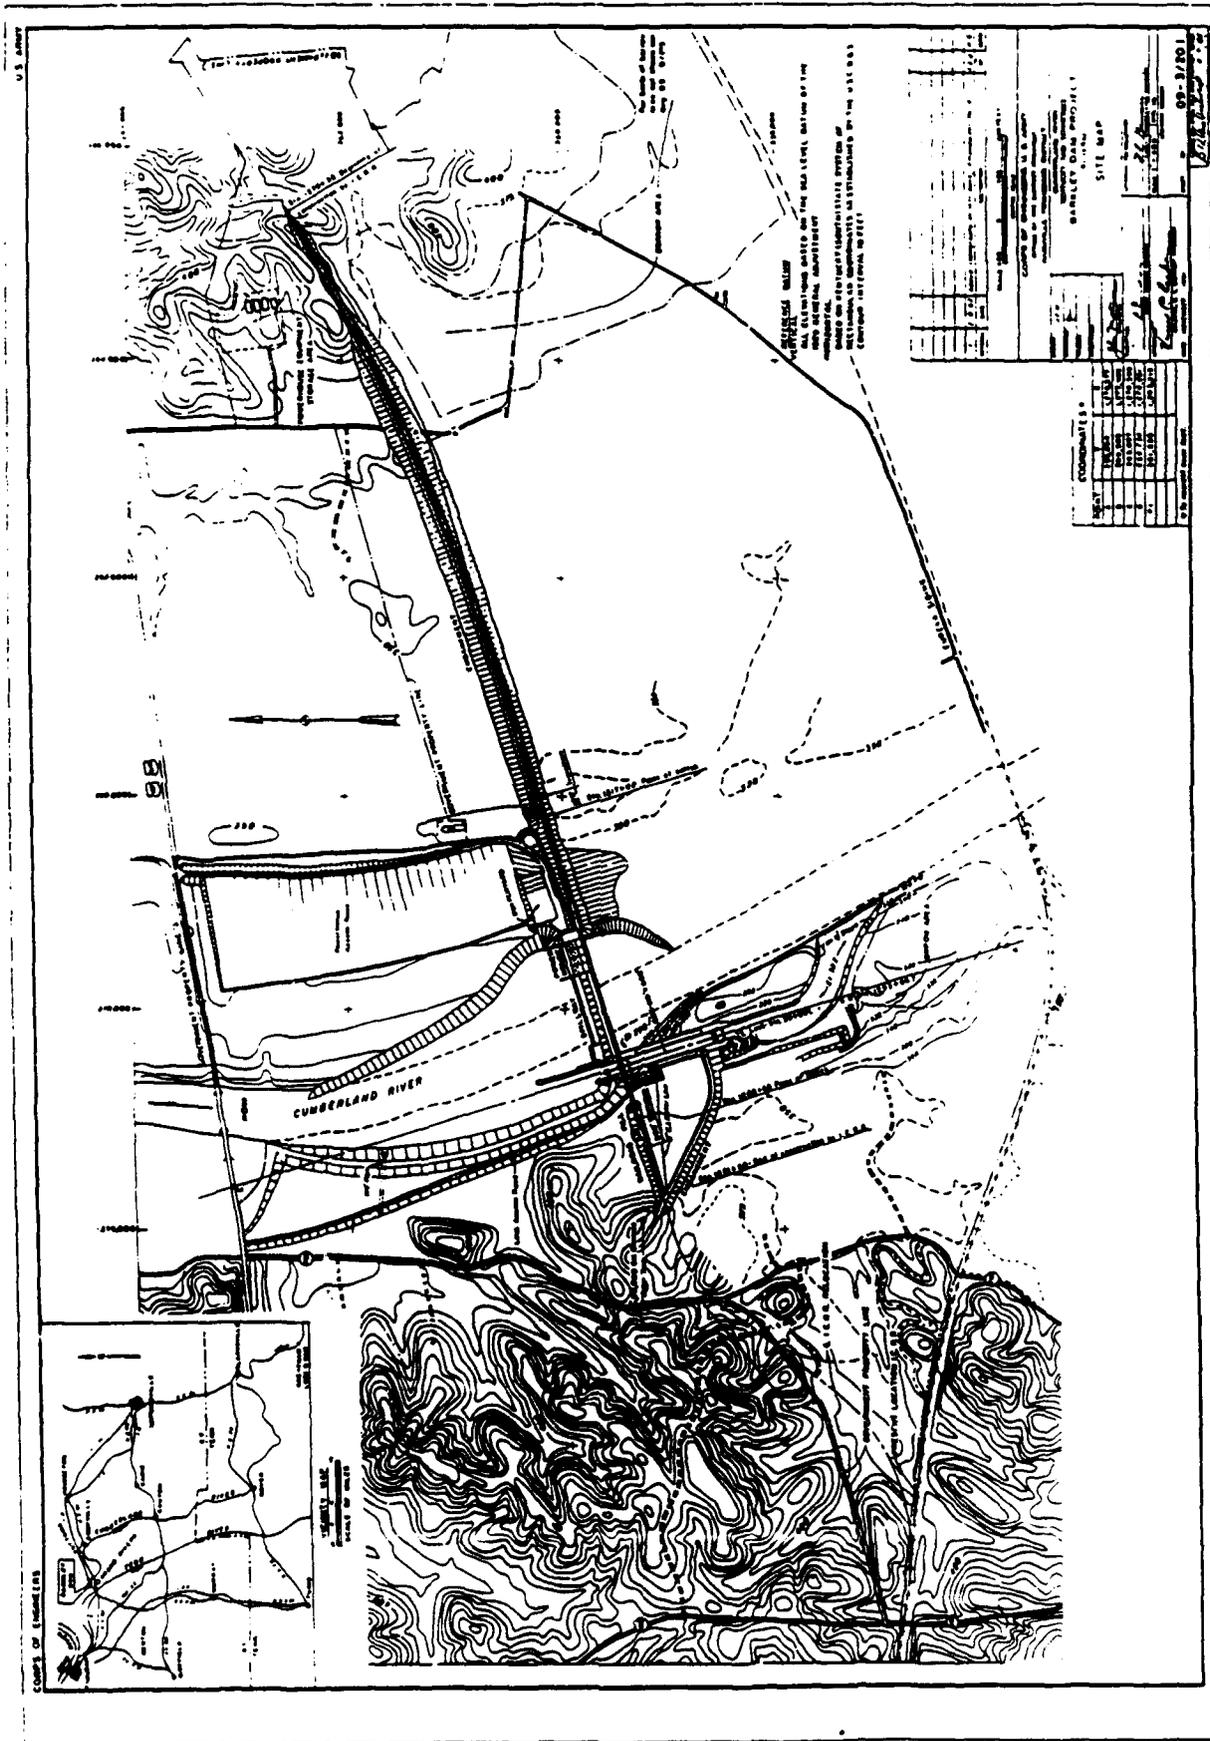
Plan view and locality sketch of Barkley lock and Dam Project.
